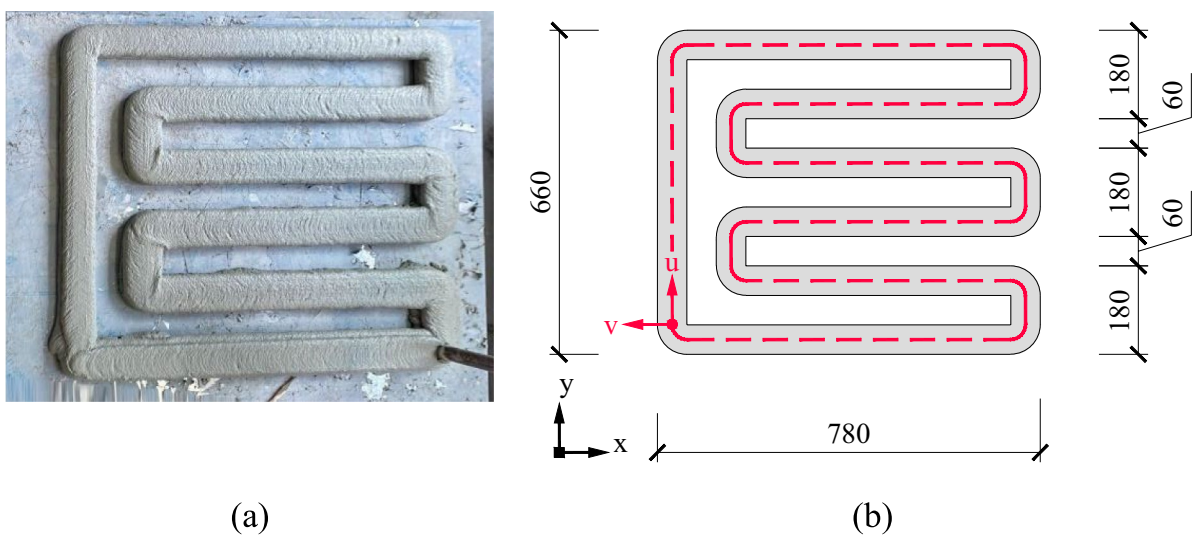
3DPC specimen in the printing phase (a) and its plan view with dimensions (b). Measures in millimeters
